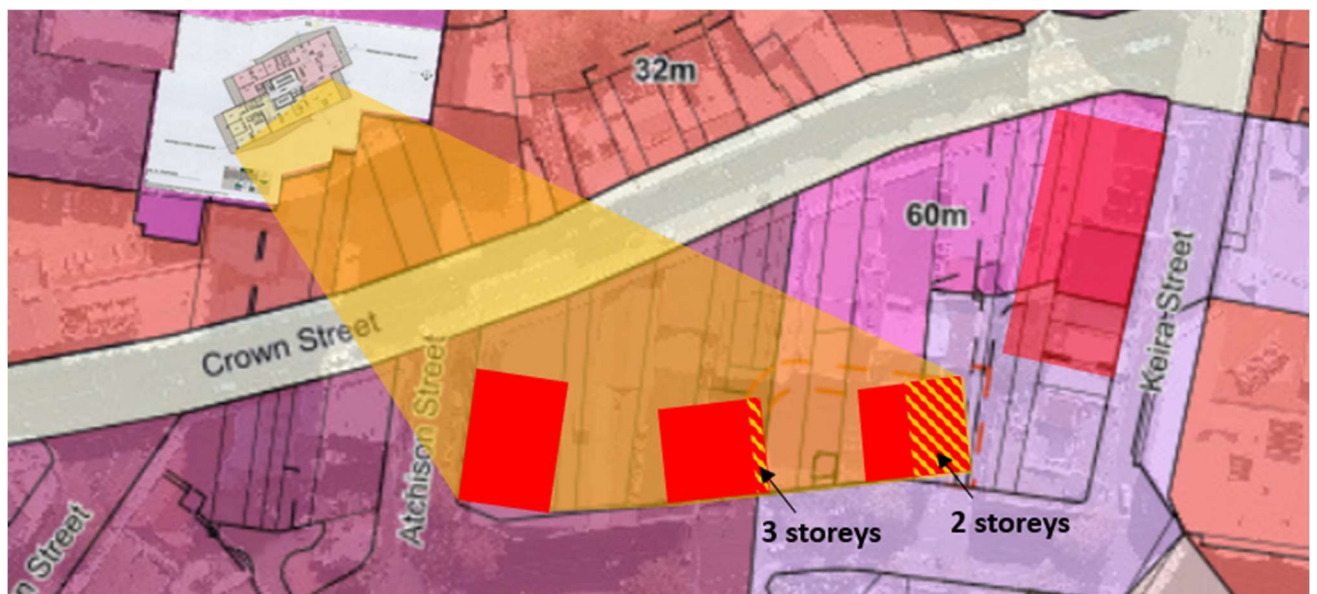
Overlay of Avante floor plan with proposed tower forms including areas of height exceedance
